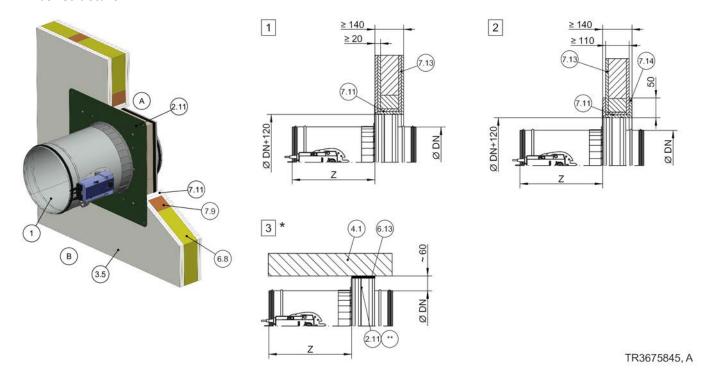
Dry mortarless installation into a lightweight partition wall, half-timbered construction, using installation kit TO
